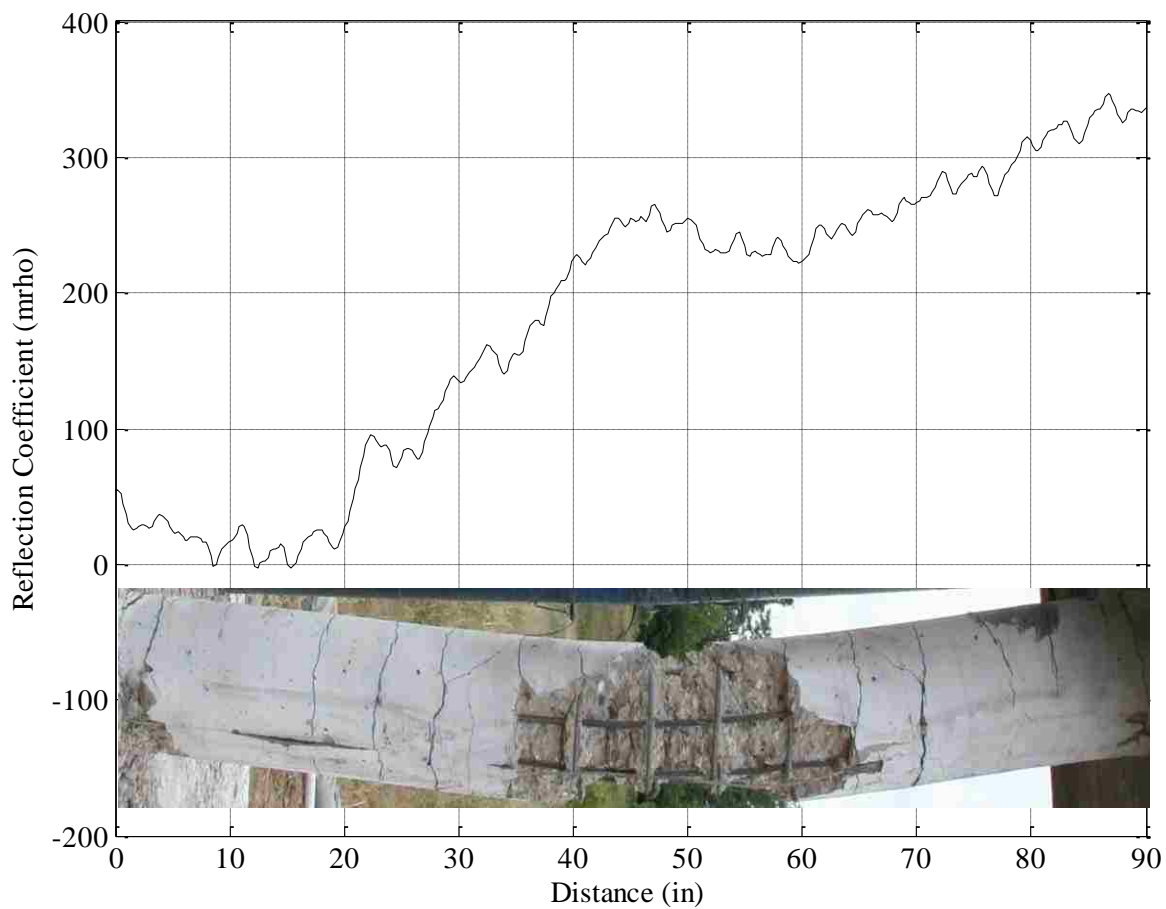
Column 1 30 lbs Crack Sensor Signal Compared to Picture of Cracking
